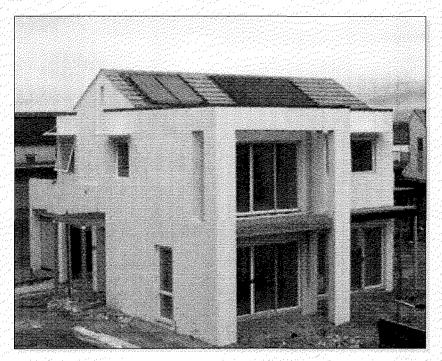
Typical house in solar village showing hot water system and PV-on roof
